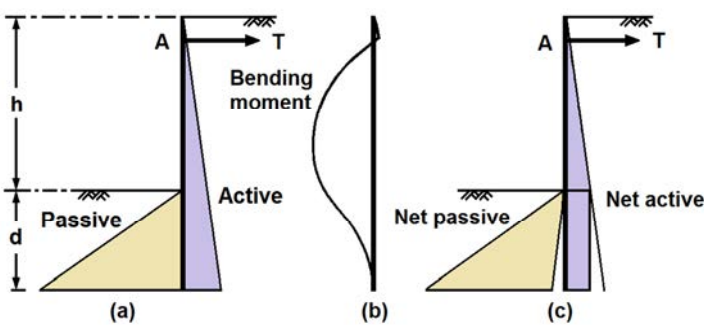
Anchored Sheetpile Wall: Free Earth Support Method
